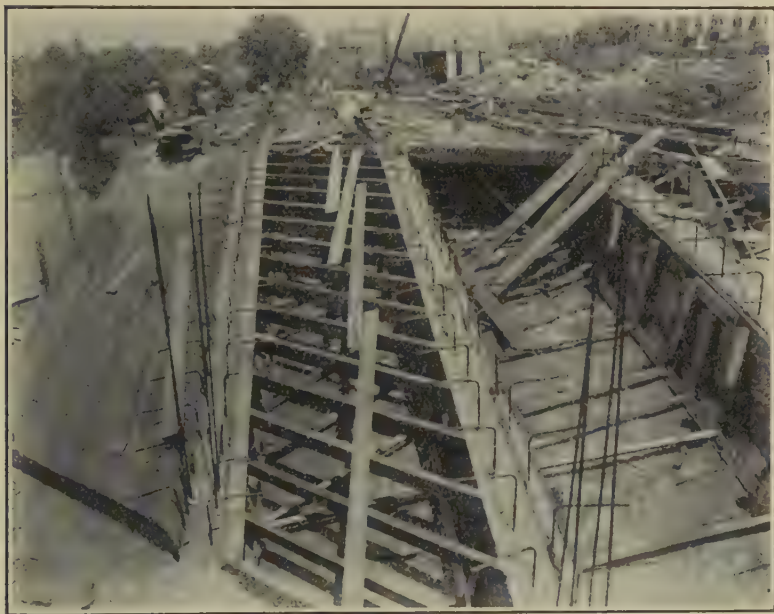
RIBS AND EXTRADOS SLAB CONSTRUCTION.
